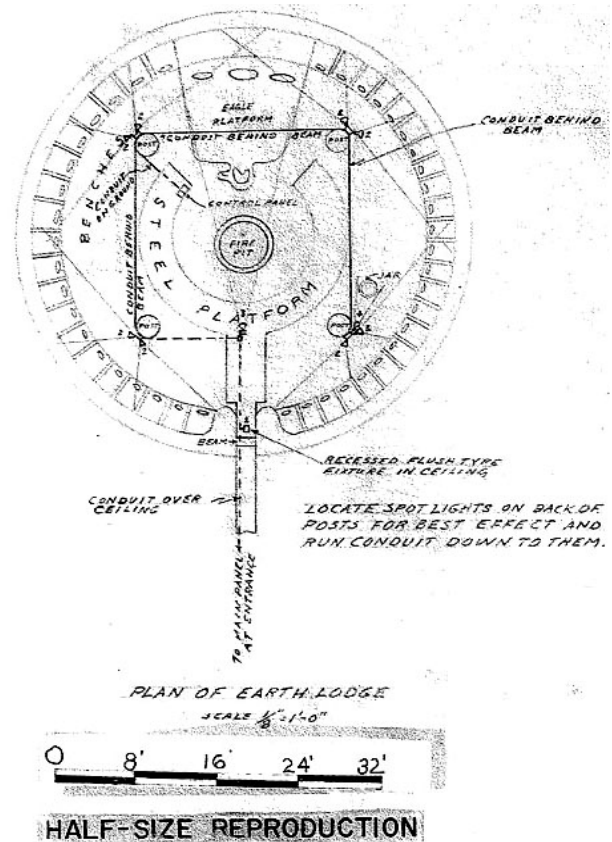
Plan for new lighting system, 1952. (OCMU Coll. )
